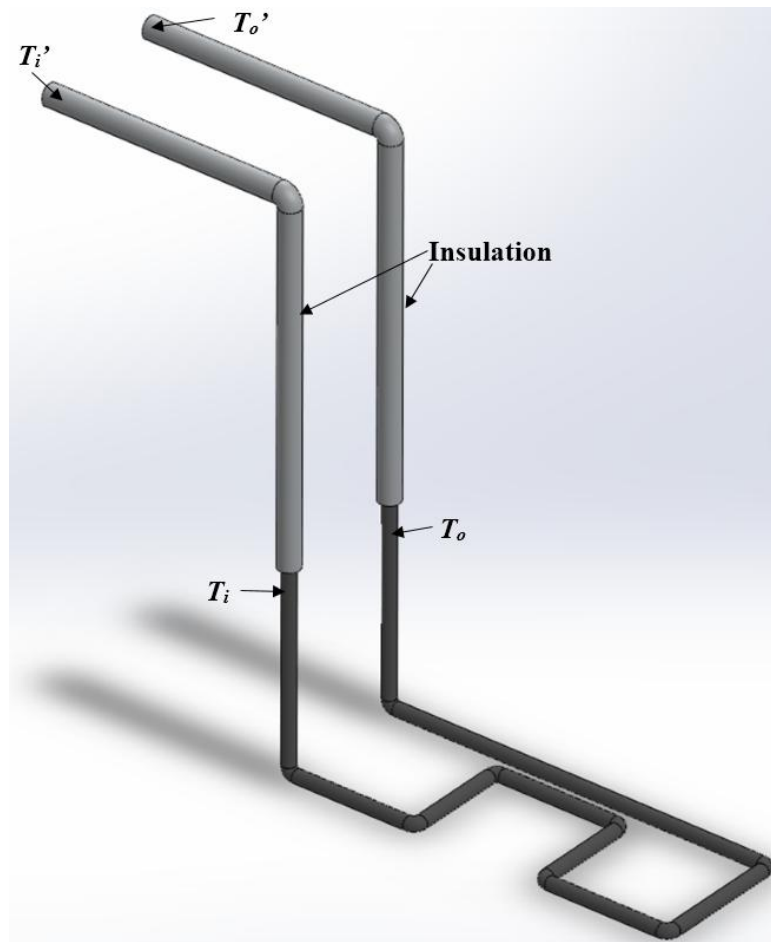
EAHE Pipe Layout with Insulation in Solid Modeling
